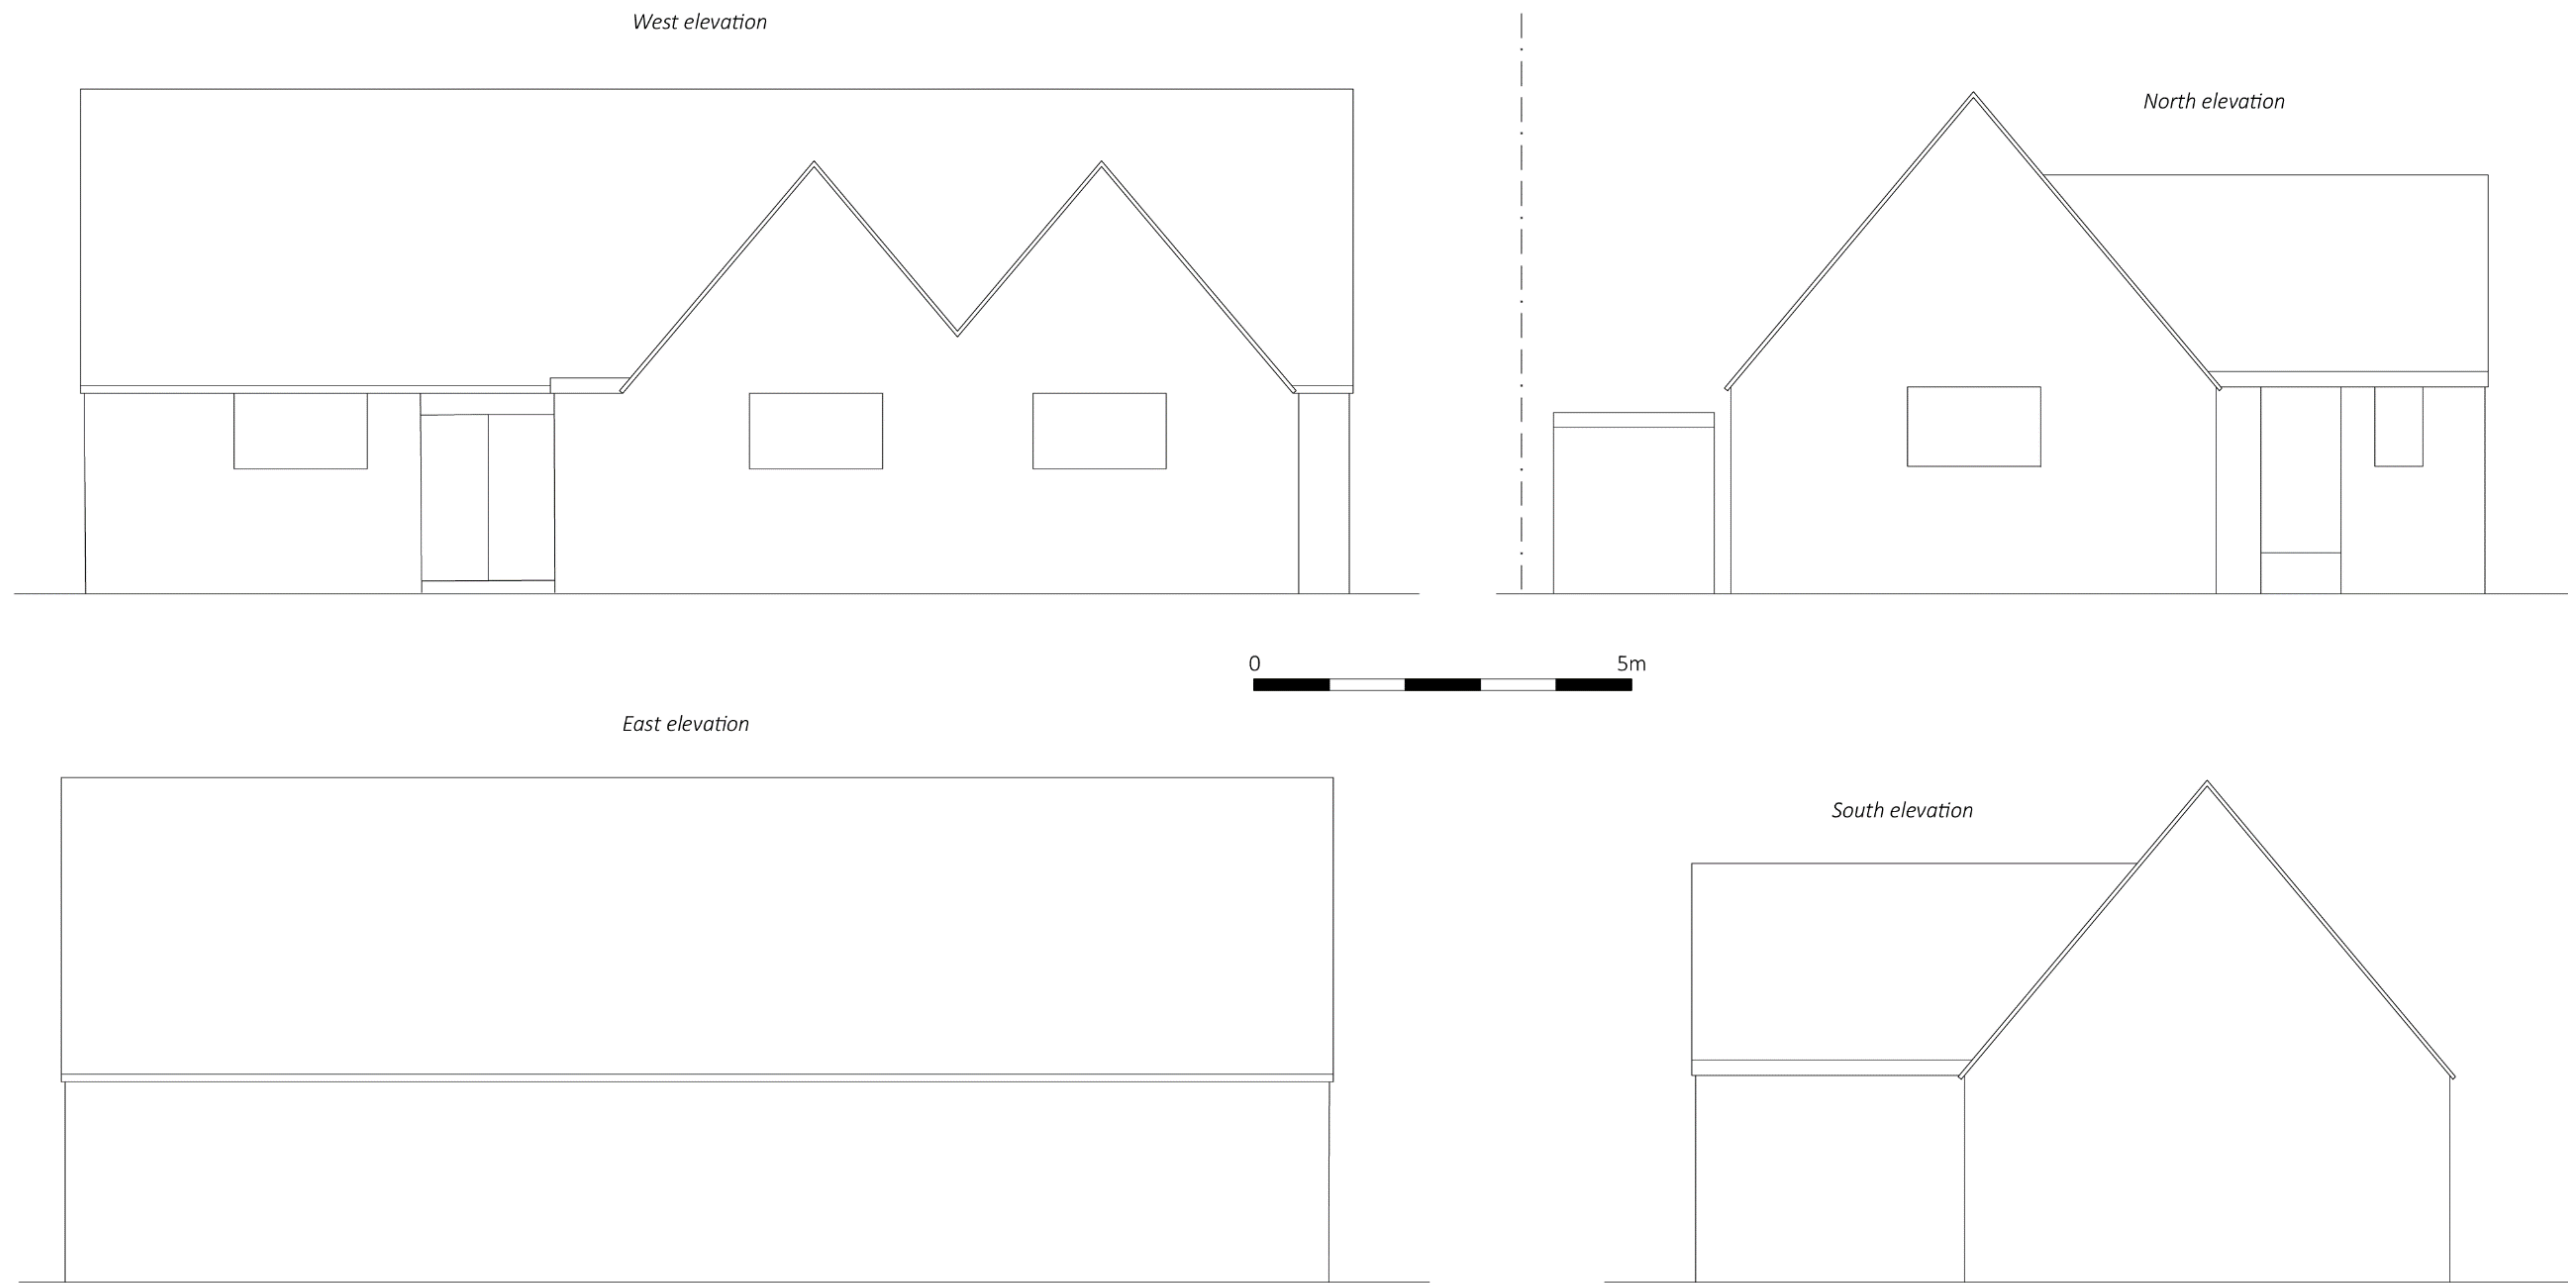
Old Telephone Exchange elevations (scale 1:100)
